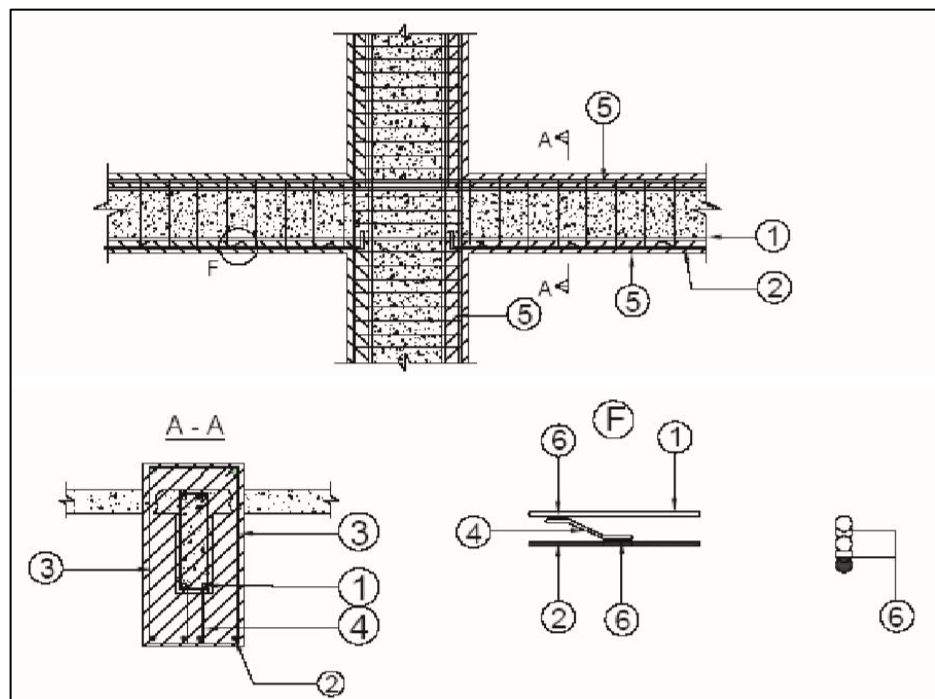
Strengthening of concrete beams by one-sided jacketing (1. Existing reinforcement; 2. Added longitudinal reinforcement; 3. Added stirrups; 4. Welded connecting bar; 5. Concrete jacket; 6. Welding)
